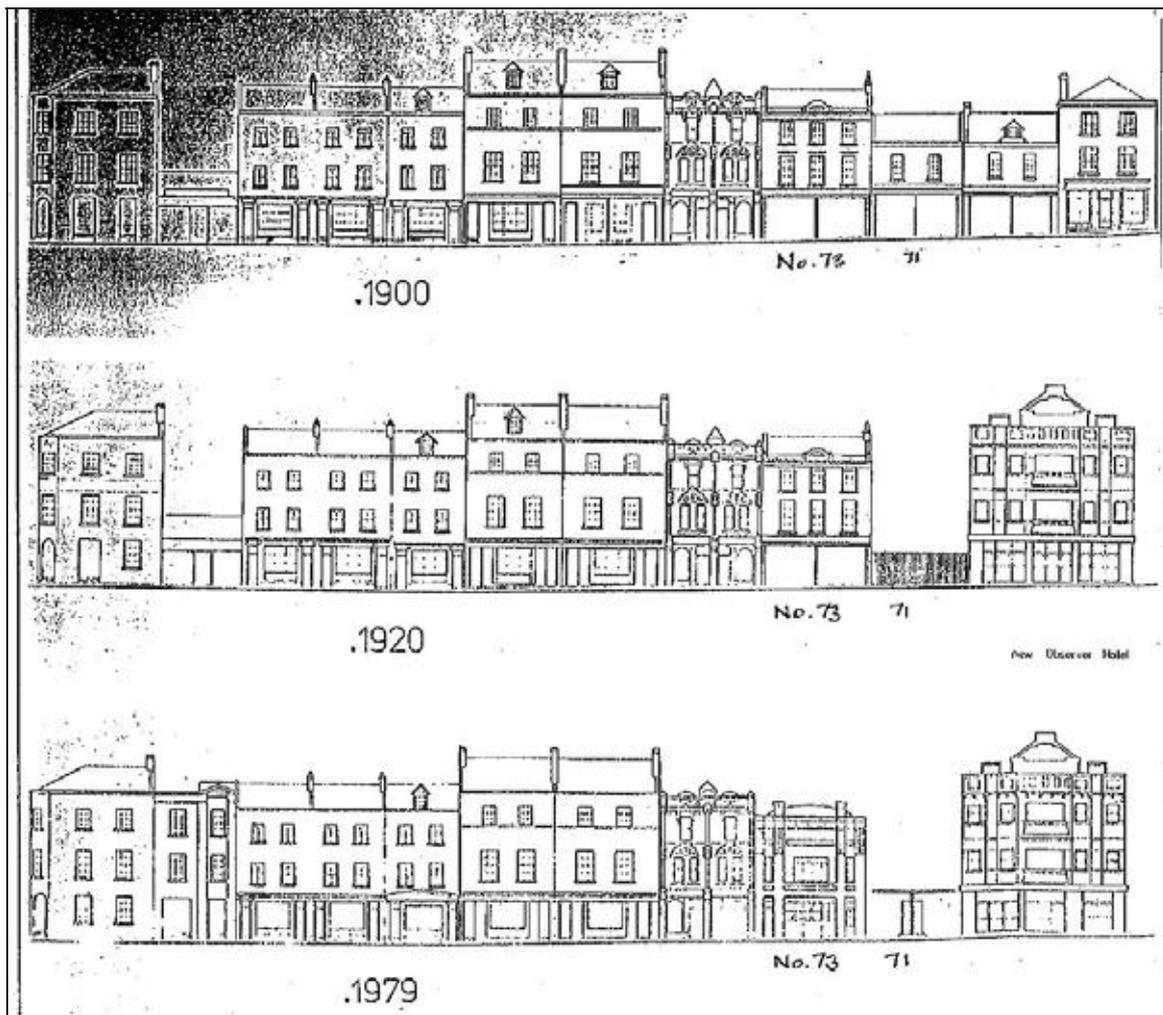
George Streetscape showing the evolution of the Ambulance Station site, 73 George Street. (Source: Foreshore Authority, c.1985 Ambulance Station Precinct Plan)
